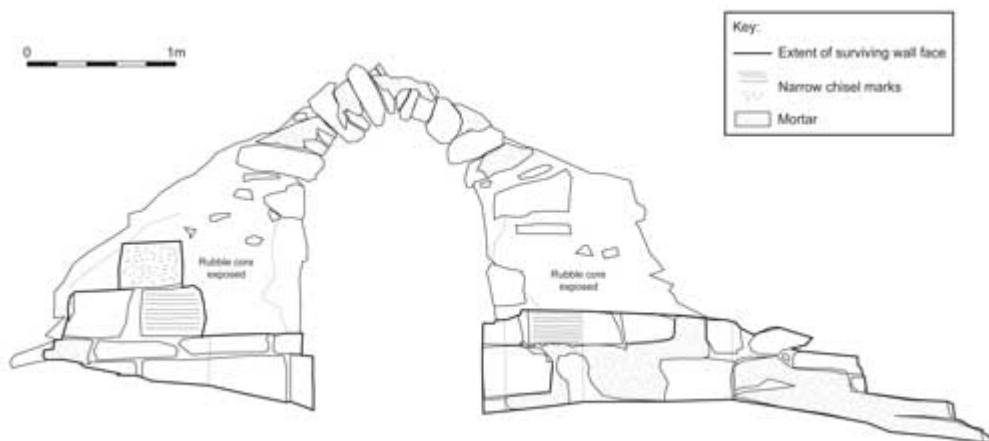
; Structure 5, Rusticated Arch: Elevation a
